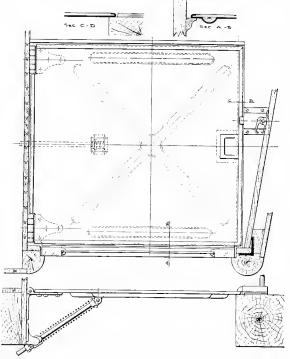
National Steel Trap Door for Grade Level Platforms. General Railway Supply Company.
